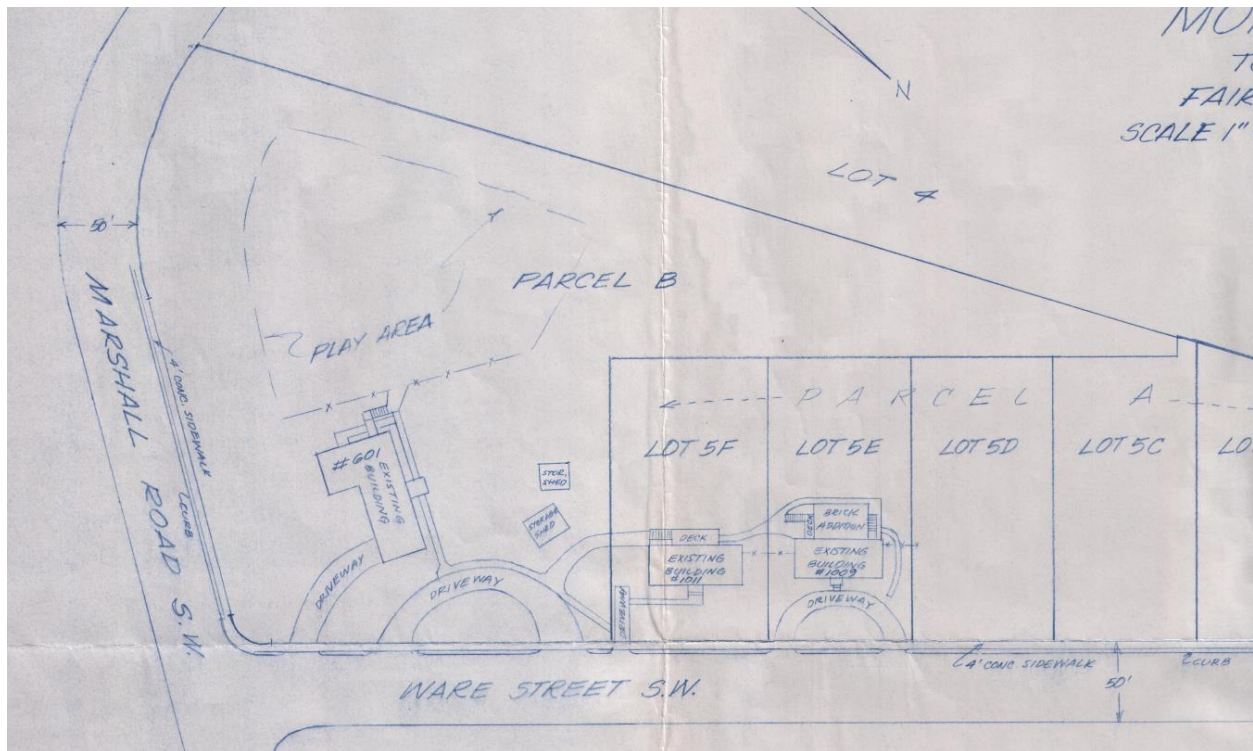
Parkwood School Layout (from 1995 CUP application)
